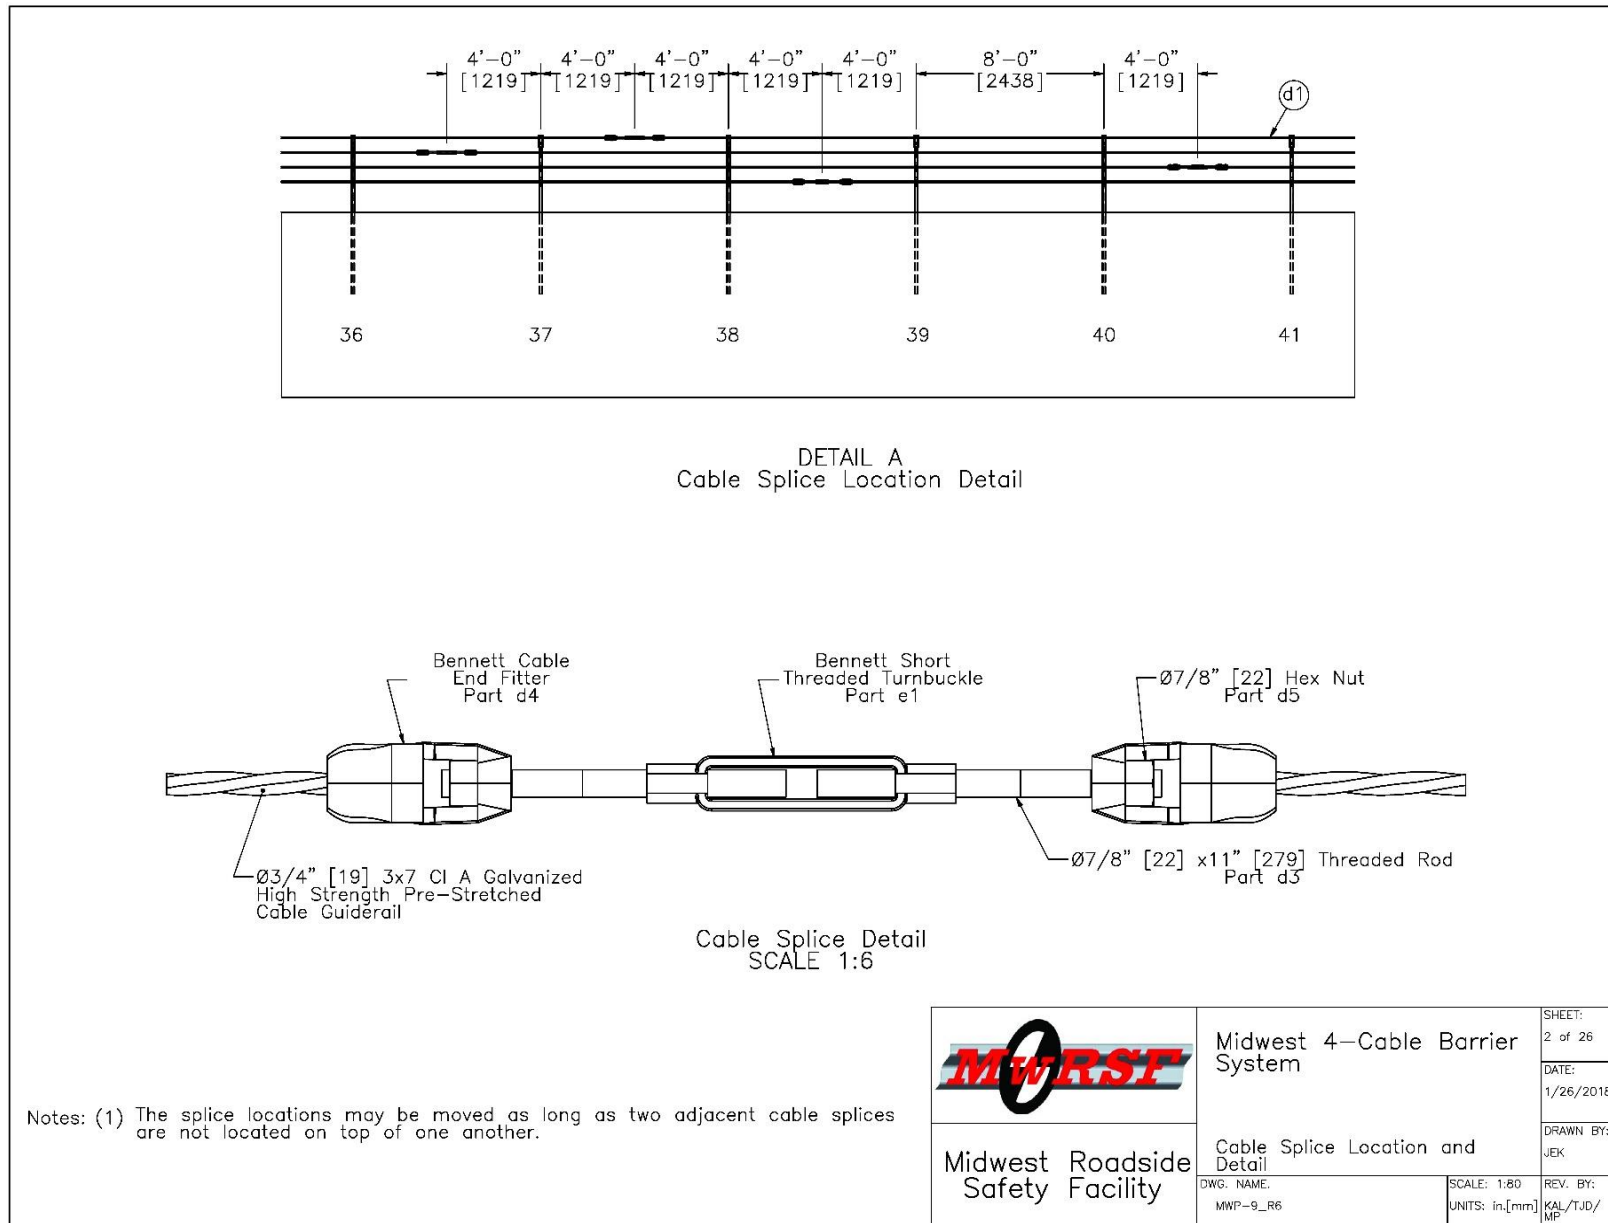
Cable Splice Location and Detail, Test No. MWP-9
